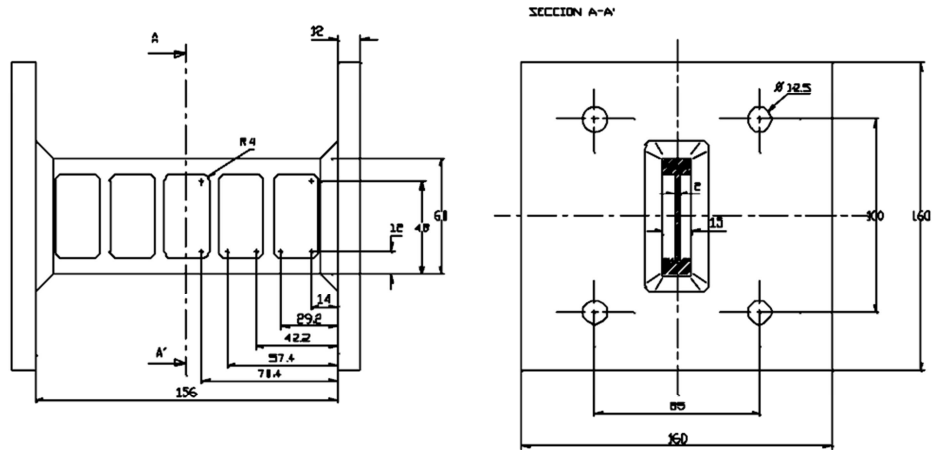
Shear Damper proposed by (Cahis et al., 1997)
